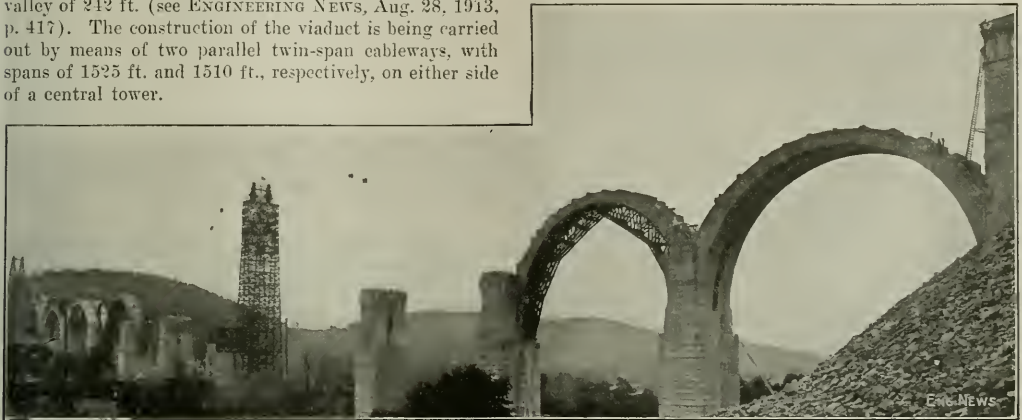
THE TUNKHANNOCK VIADUCT, D. L. & W. R.R., UNDER CONSTRUCTION, SHOWING IN CENTER THE 280-FT. CABLEWAY TOWER
